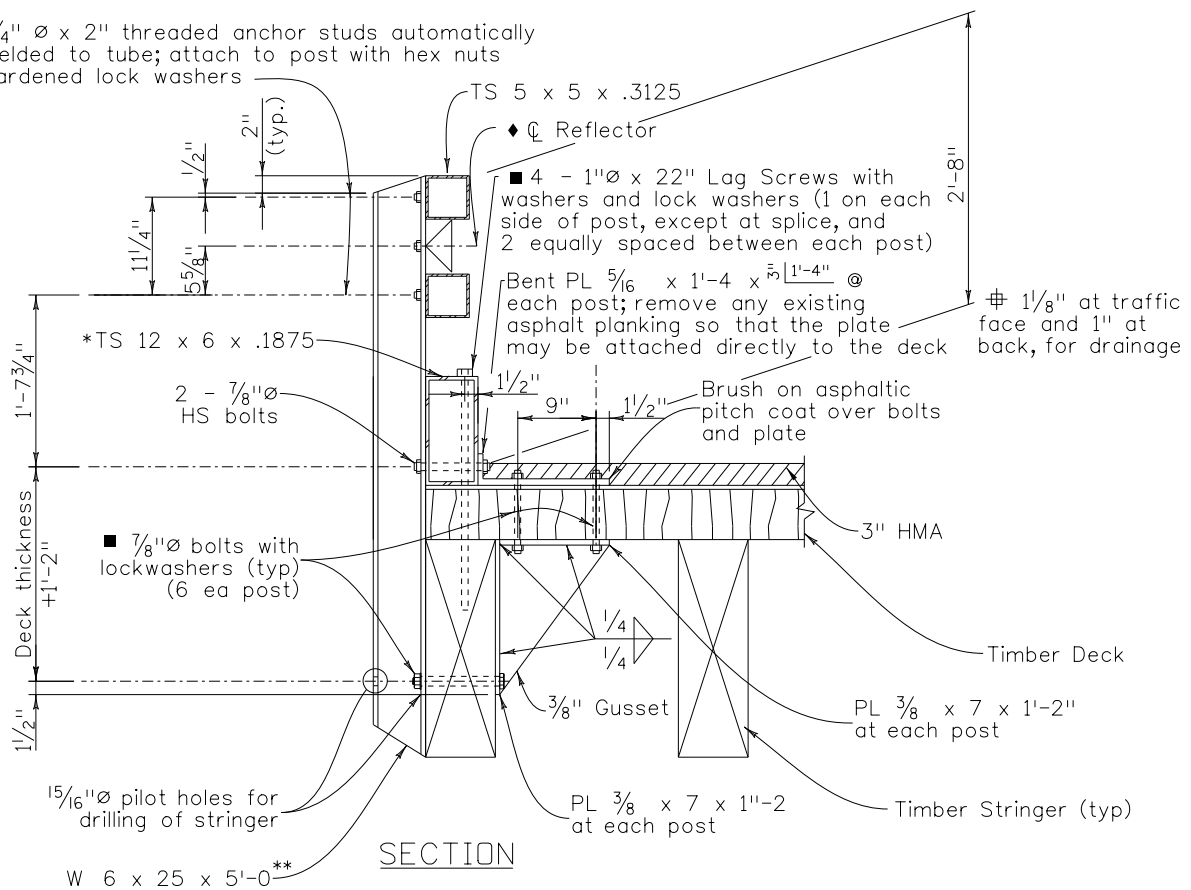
(A)-4 Sample Section showing Bridgerail Repair for Doghouse Type Rail
